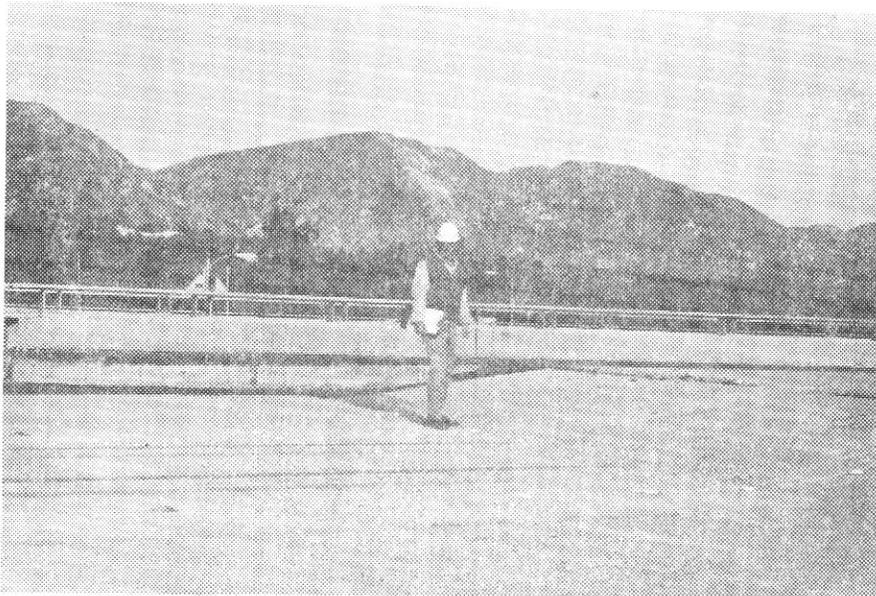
Fill settlement at west approach to eastbound structure at Polk Street Undercrossing. Note approach slab break and resulting ramp effect. The amount of settlement is indicated by the dark (AC) marking along the bridge rail.
